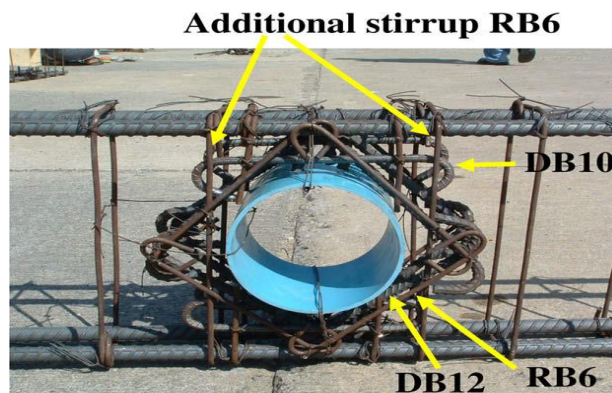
RCC beam steel detailing for transverse opening [2] -
